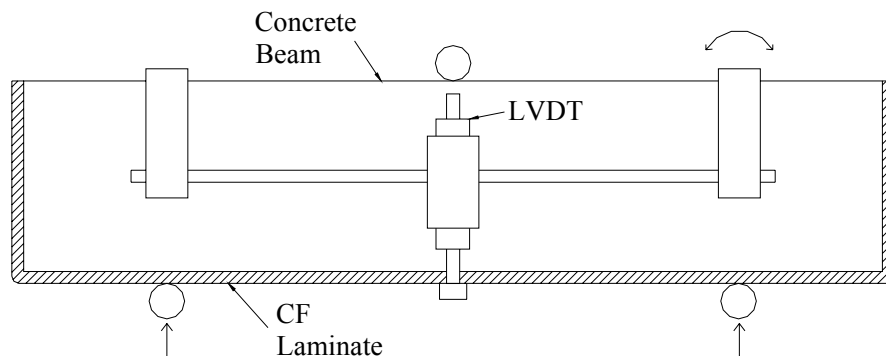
Setup of a CFRP reinforced concrete beam 3-point bending test
